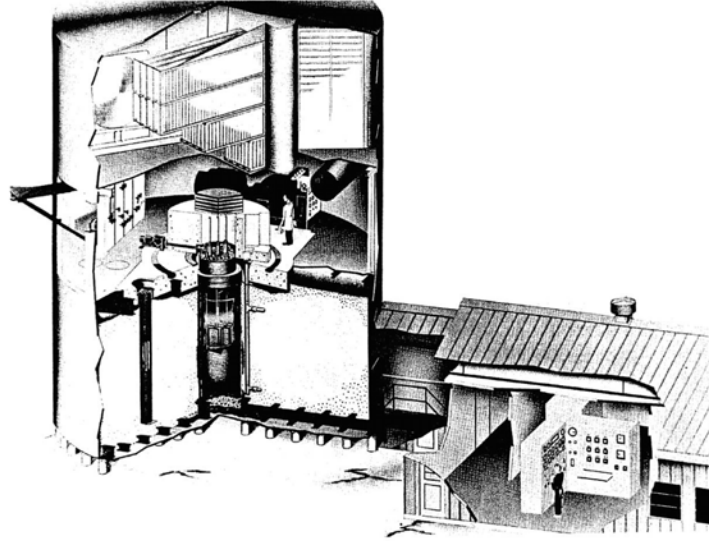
Cutaway Drawing of the SL-1 Facility (Ref. A-50)
